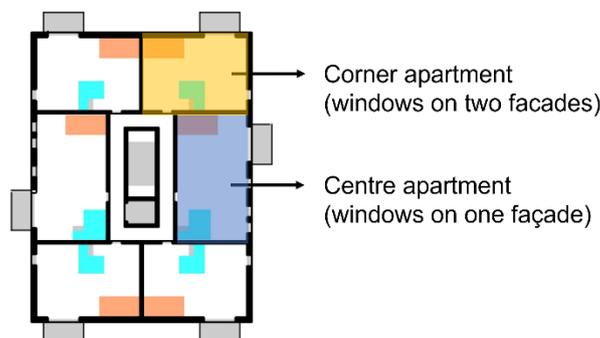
Picture showing the layout of the corner apartment and centre apartment in building typology 1.
